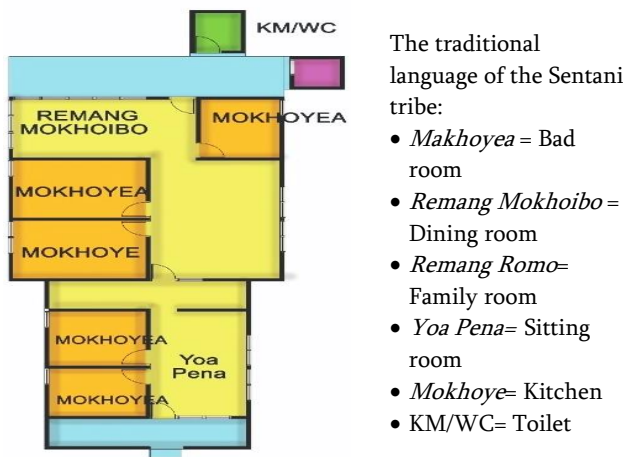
Plan/layout of a traditional house in a farmer's habitus
